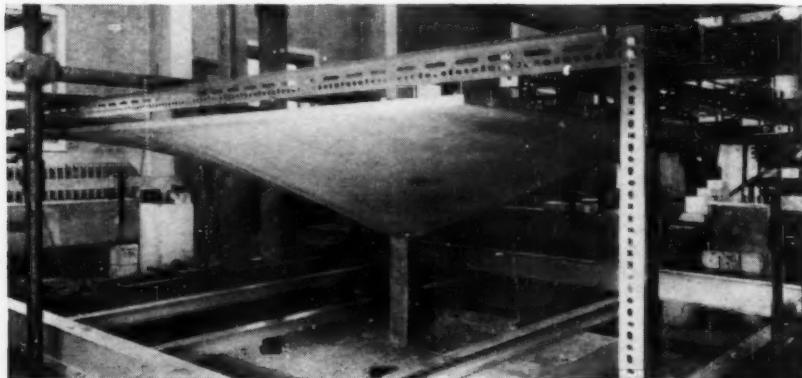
Model of Complete Hyperbolic-paraboloidal Slab.
